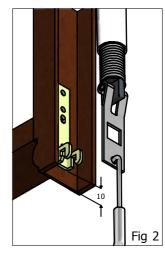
The UK118 bracket is then pulled down and the square hole located over the jaws on the UK120 bracket. The tension on the balance spring will hold the balance bracket in place. No screws should be fixed through the UK118 bracket.
